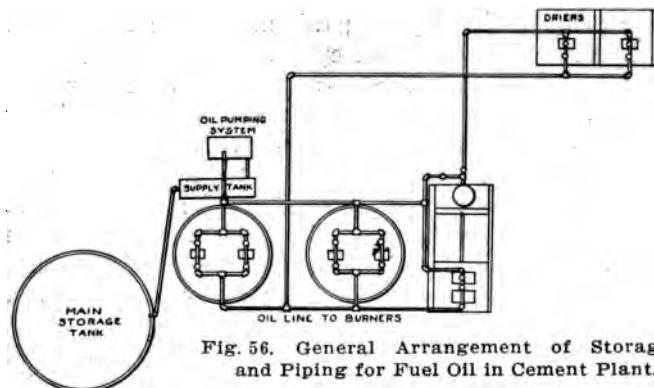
General Arrangement of Storage and Piping for Fuel Oil in Cement Plant.
